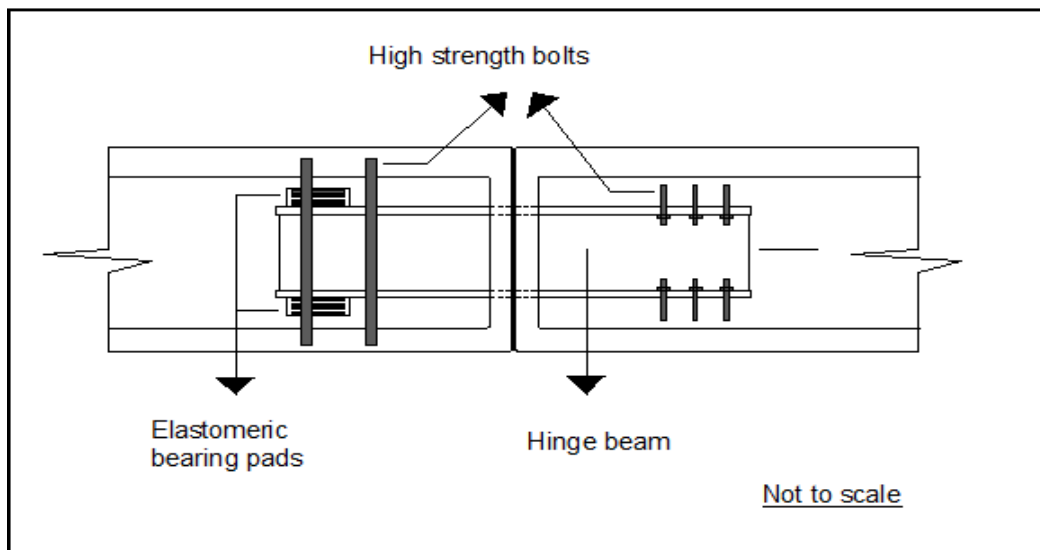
2 Side view of the proposed hinge connection retrofitting.
